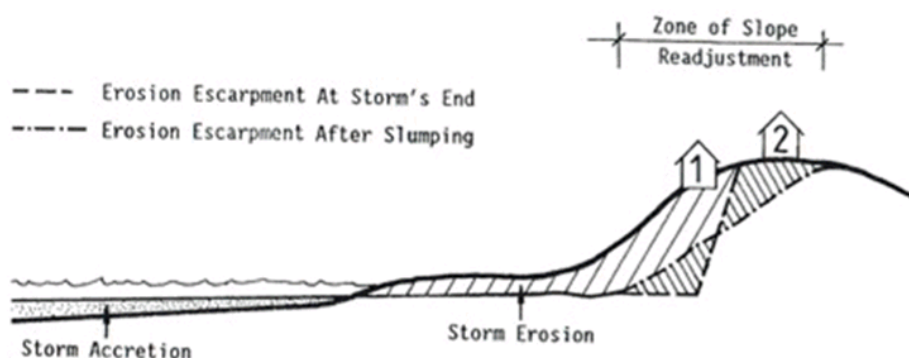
Post Storm Slope Adjustment of Eroded Dunes (14)
